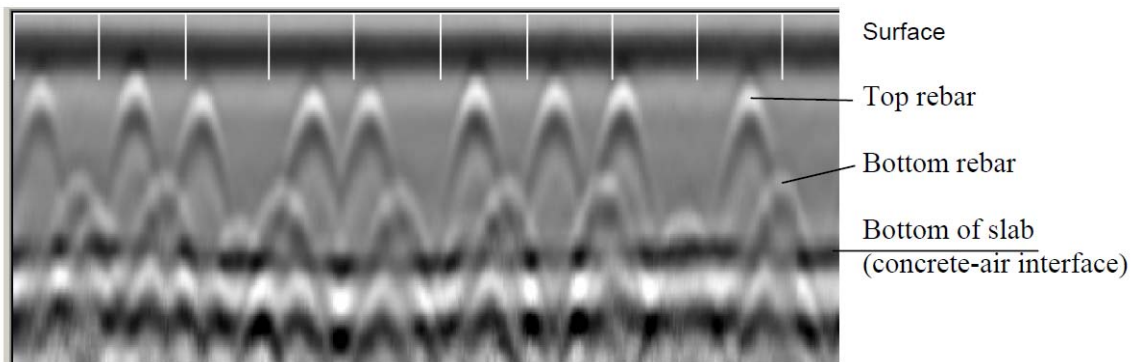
Mapping multiple layers of steel in concrete (GSSI).
